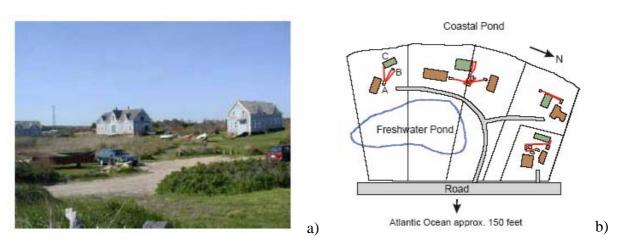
Residential compound (a), site plan (b) (Joubert et al., 2004)
